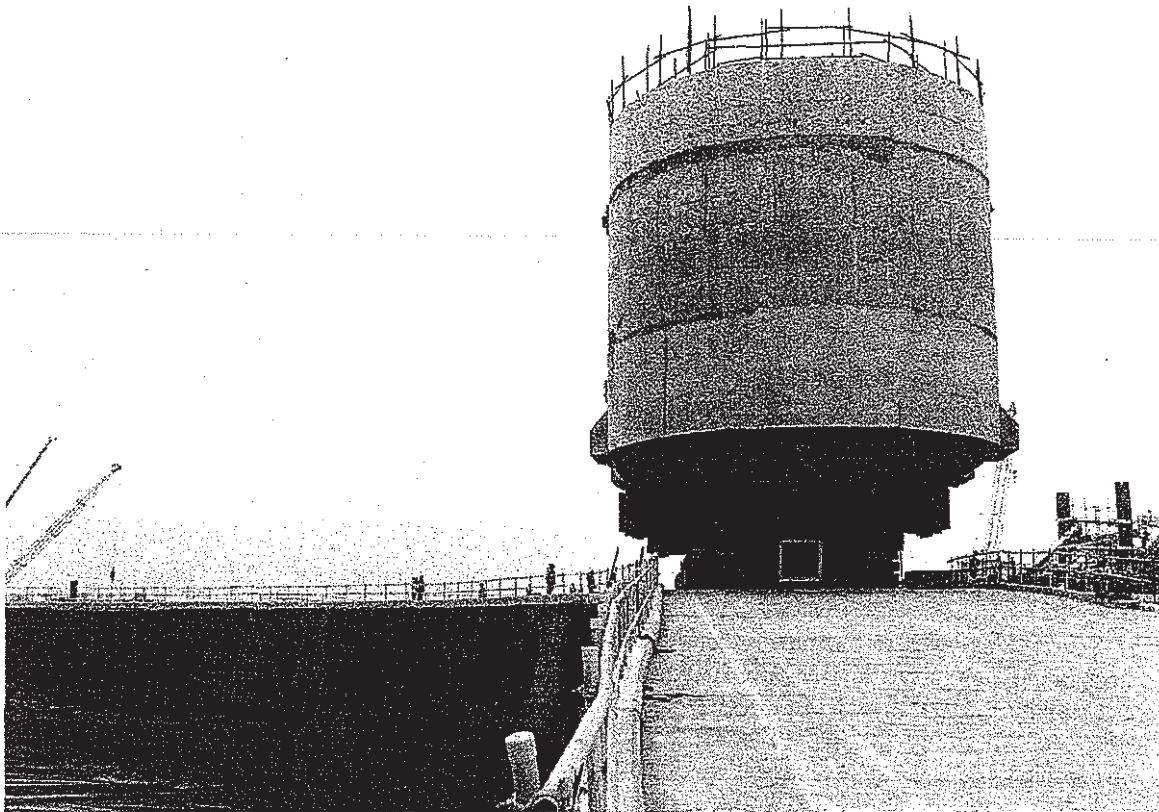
Caisson travels down ramp 1 metre away from edge of facing
